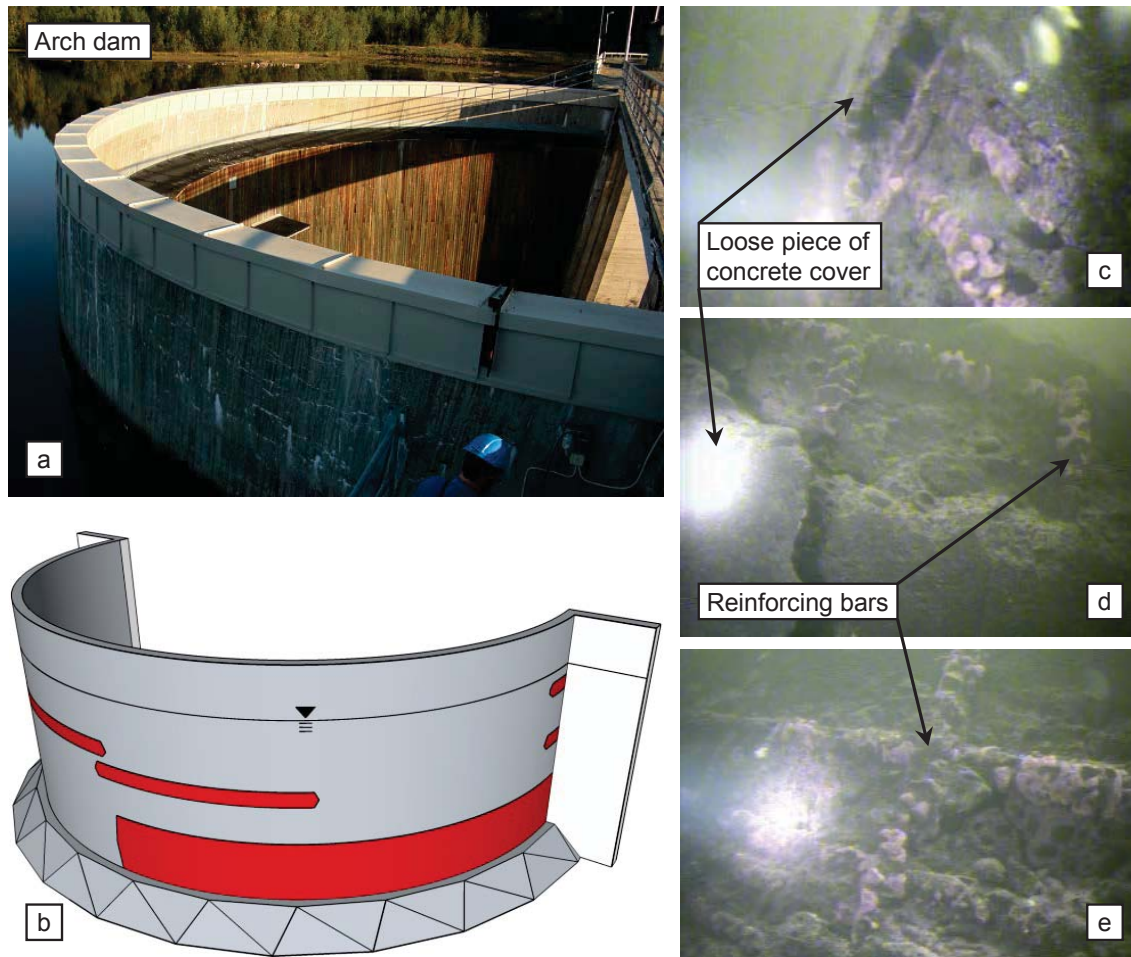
The greater part of the damage to the arch dam (a) was found on the lower part of the dam (b). Photos (c–e) show corroding reinforcing steel and loose pieces of concrete on the upstream face of the dam. Photos provided by Skellefteå Kraft AB.
